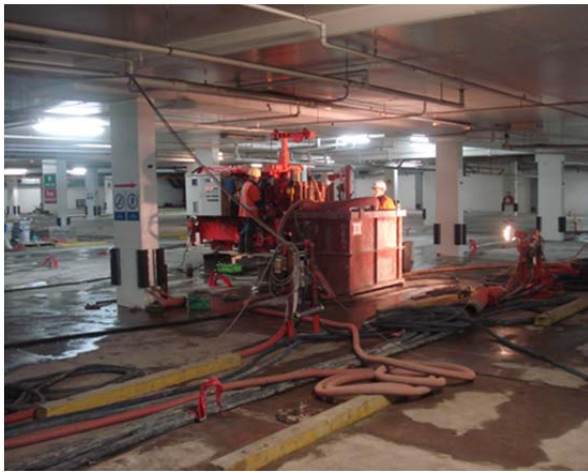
Installation of jet grouting columns in the Art Gallery basement
